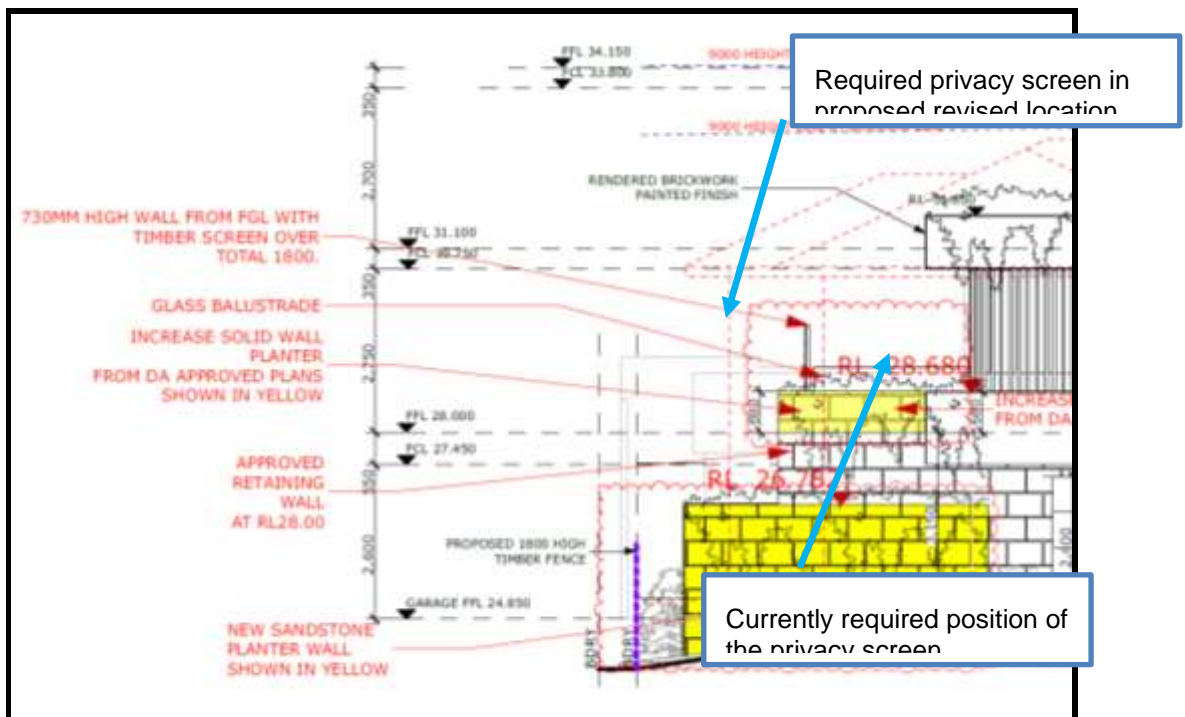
Proposed retaining walls and privacy screen (Source: Issue L plans – David Dechiara, 24/5/22)
